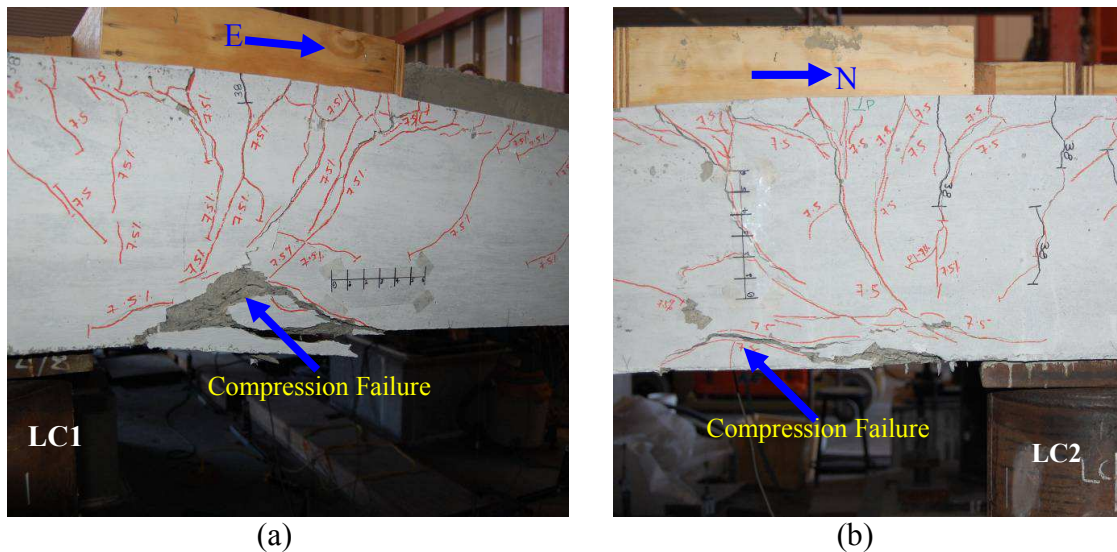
Local failure and concrete spalling at beam support locations: (a) E-W beam at support LC1, (b) N-S beam at support location LC2.
